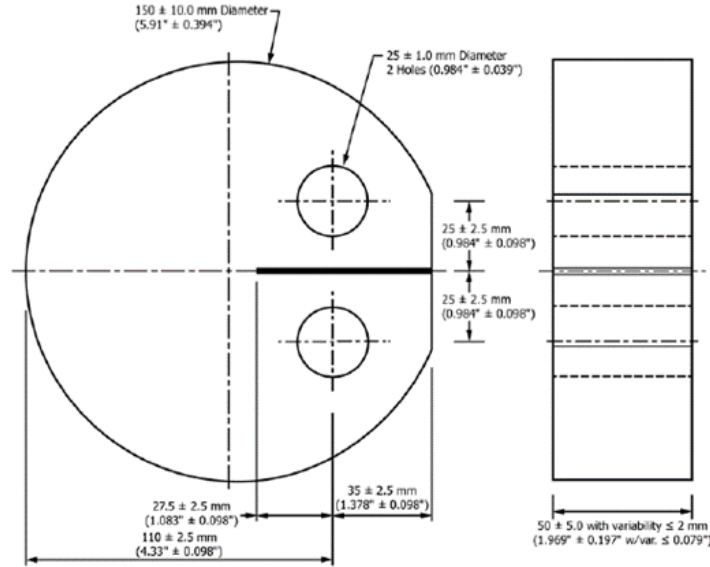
DCT Specimen Dimensions as per ASTM D 7313 Standards
